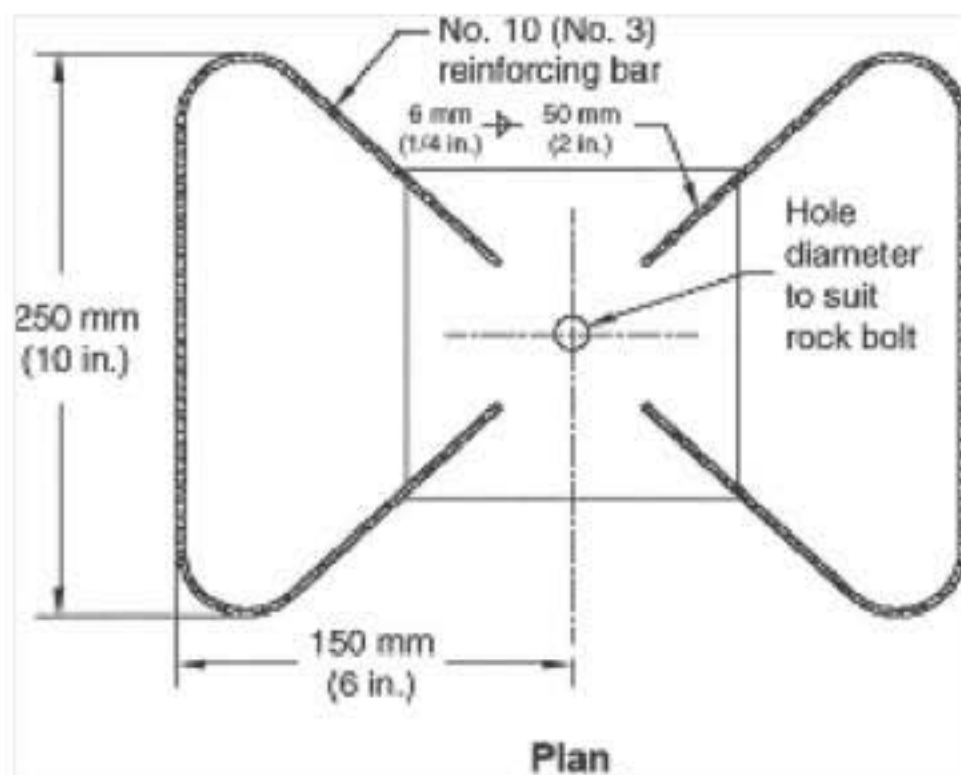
Rock bolt anchor plates with reinforcing bar “wings.”
